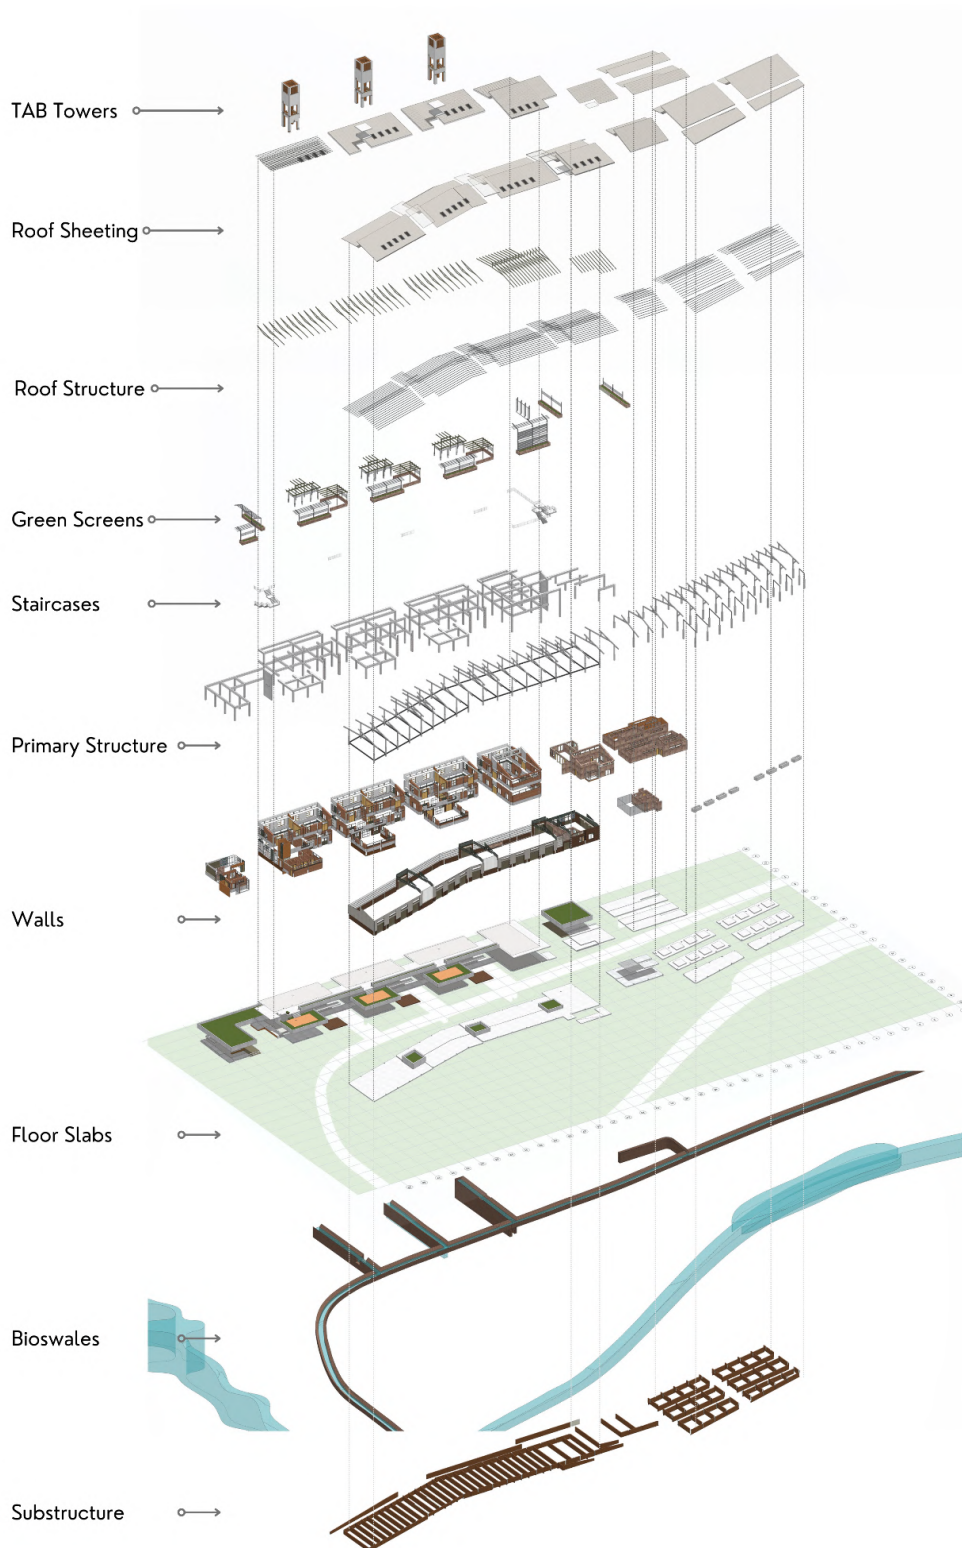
An exploded axonometric showcasing the structural systems used in the project namely: the 5 x 5m Concrete framed structure for the community centre and dismantlable Steel Portal Frame for the Waste Storage Unit. All walls to be infill walls with reclaimed materials. (Author 2023)
